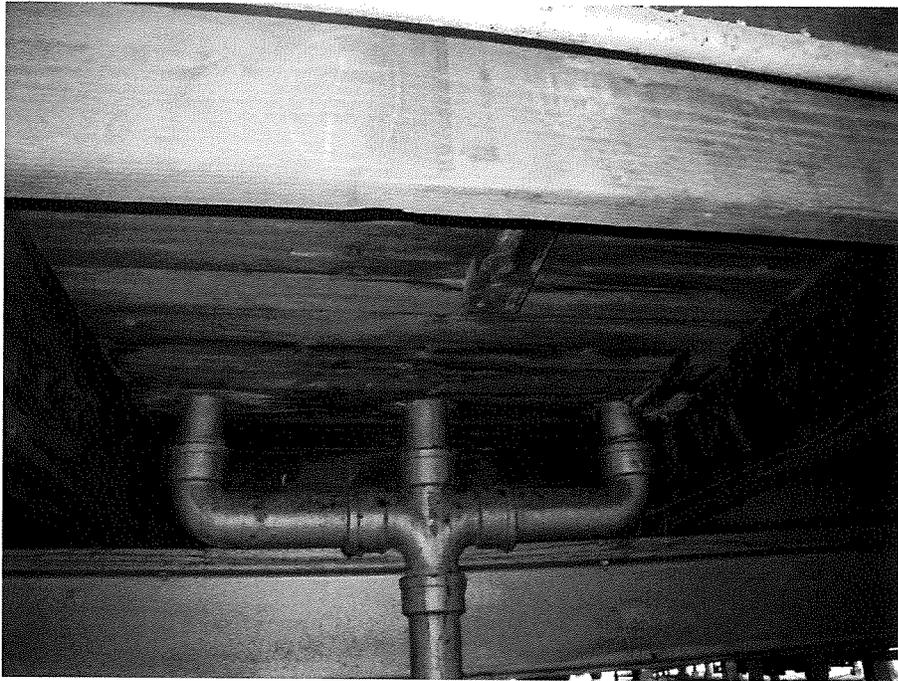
Location of Plank Stiffening (Repair per sheet S-9)
